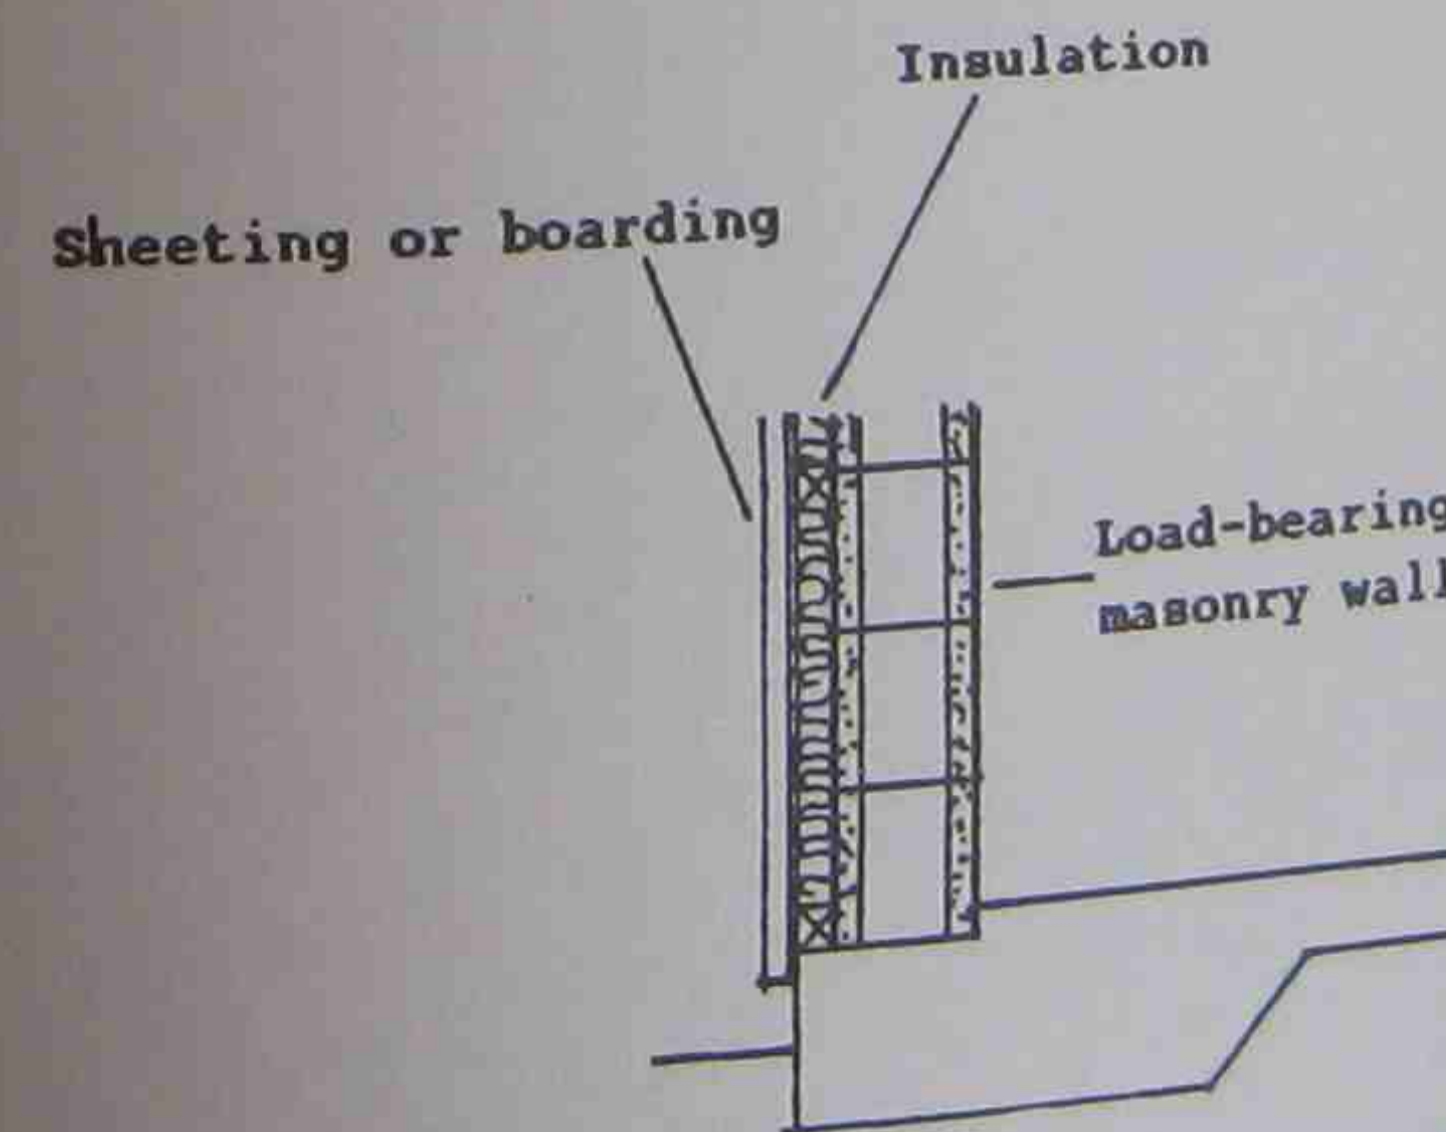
Reverse brick veneer wall based on a masonry wall. (After Szokolay, 1991).
